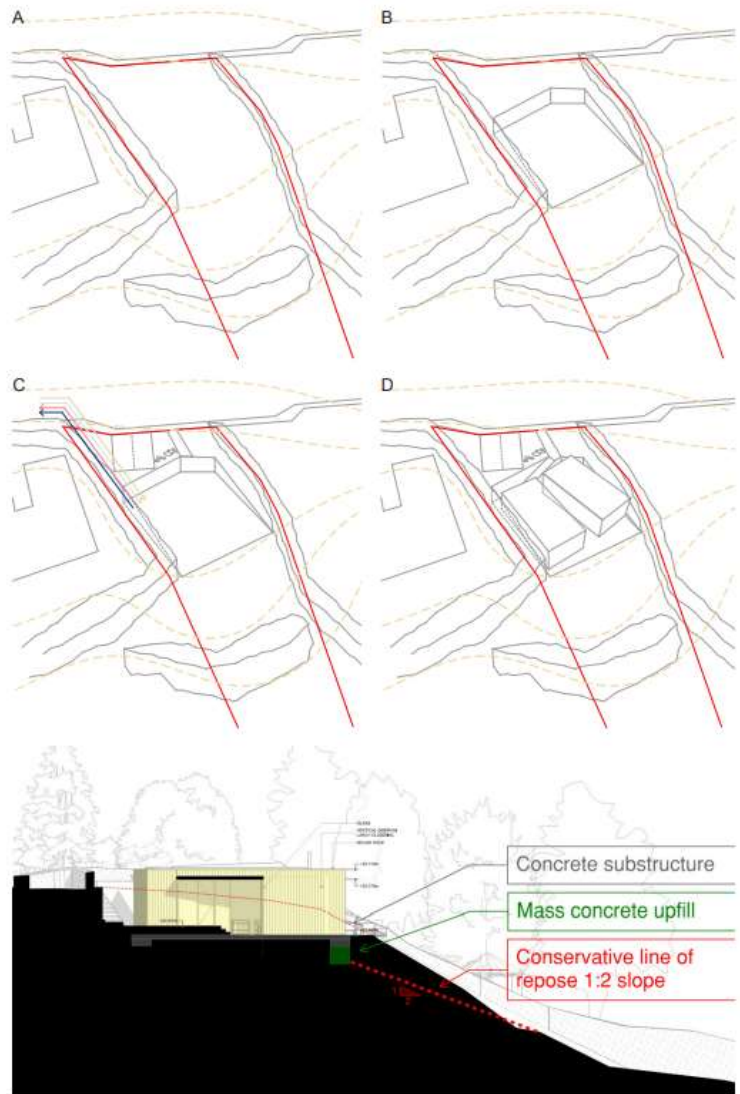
Extract of Design and Access Statement, indicating the substructure and piling design utilised to prevent land slippage and coastal erosion.
